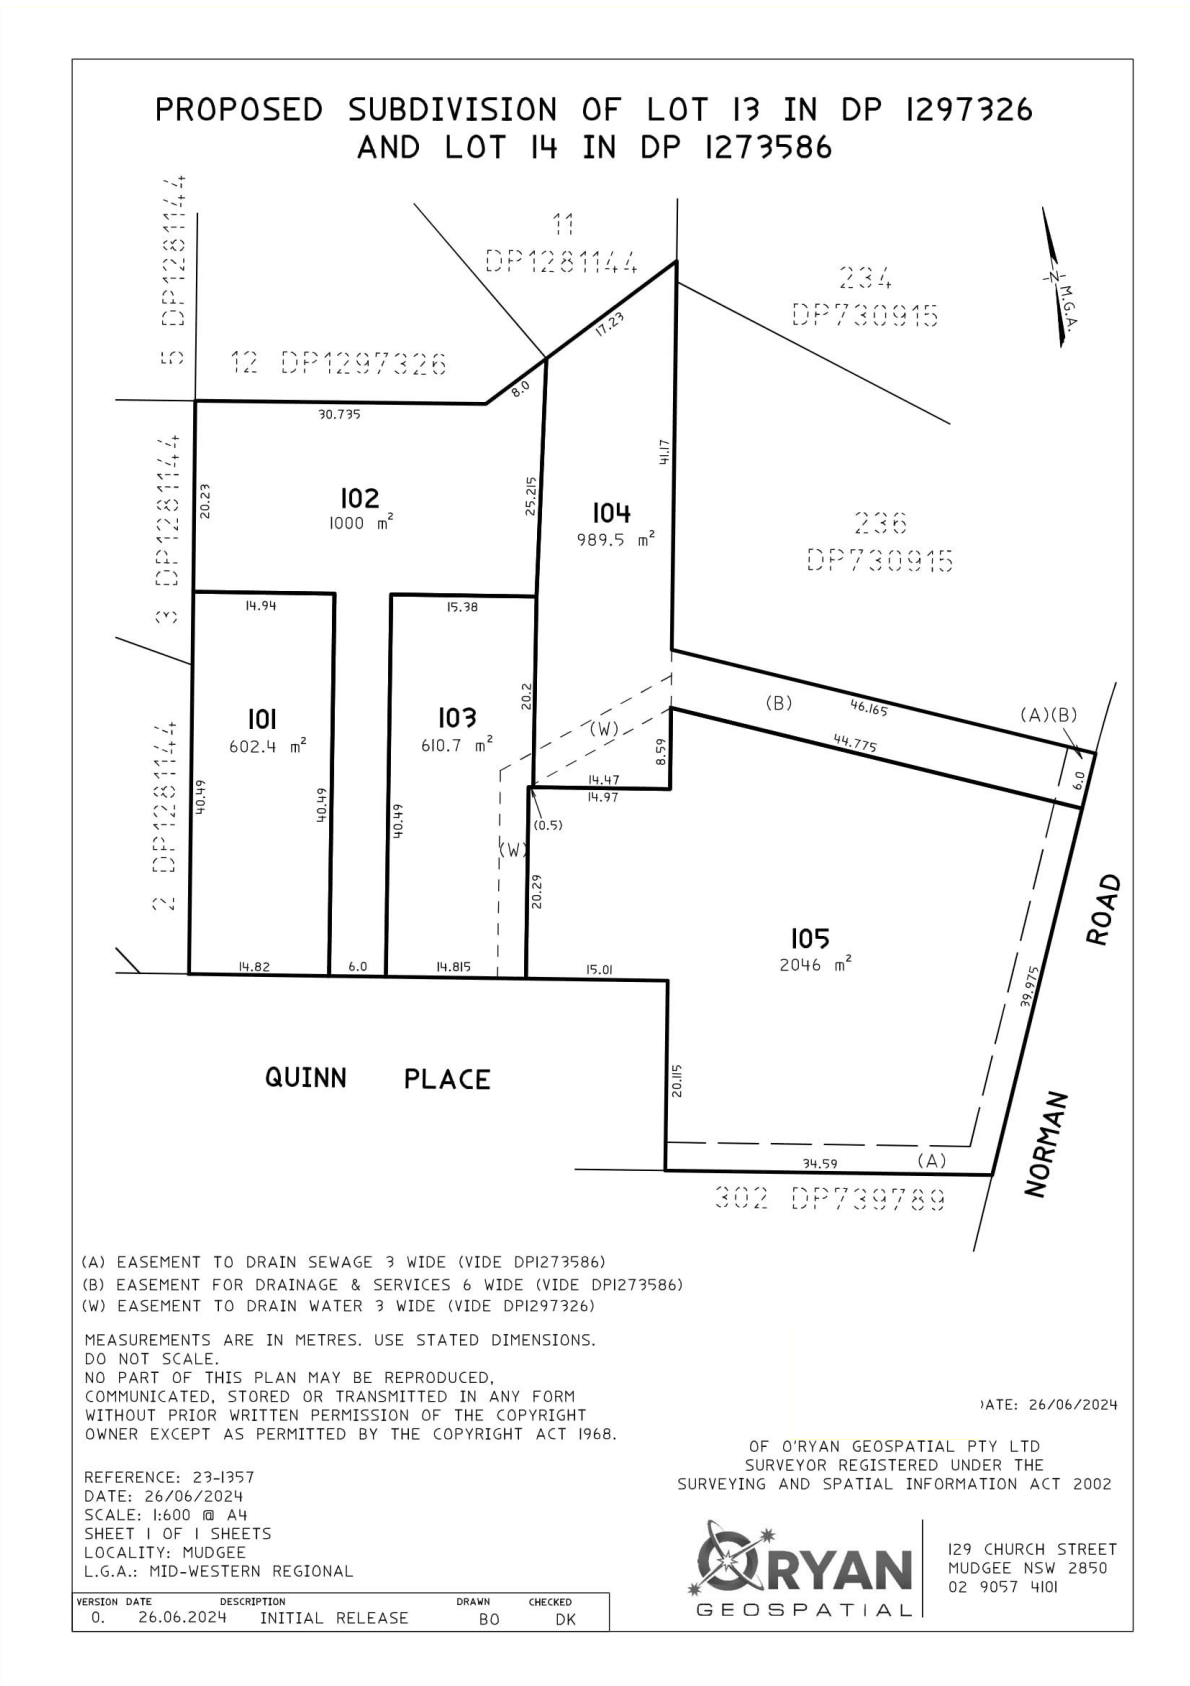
Proposed Plan of Subdivision (Source: O'Ryan Geospatial)
